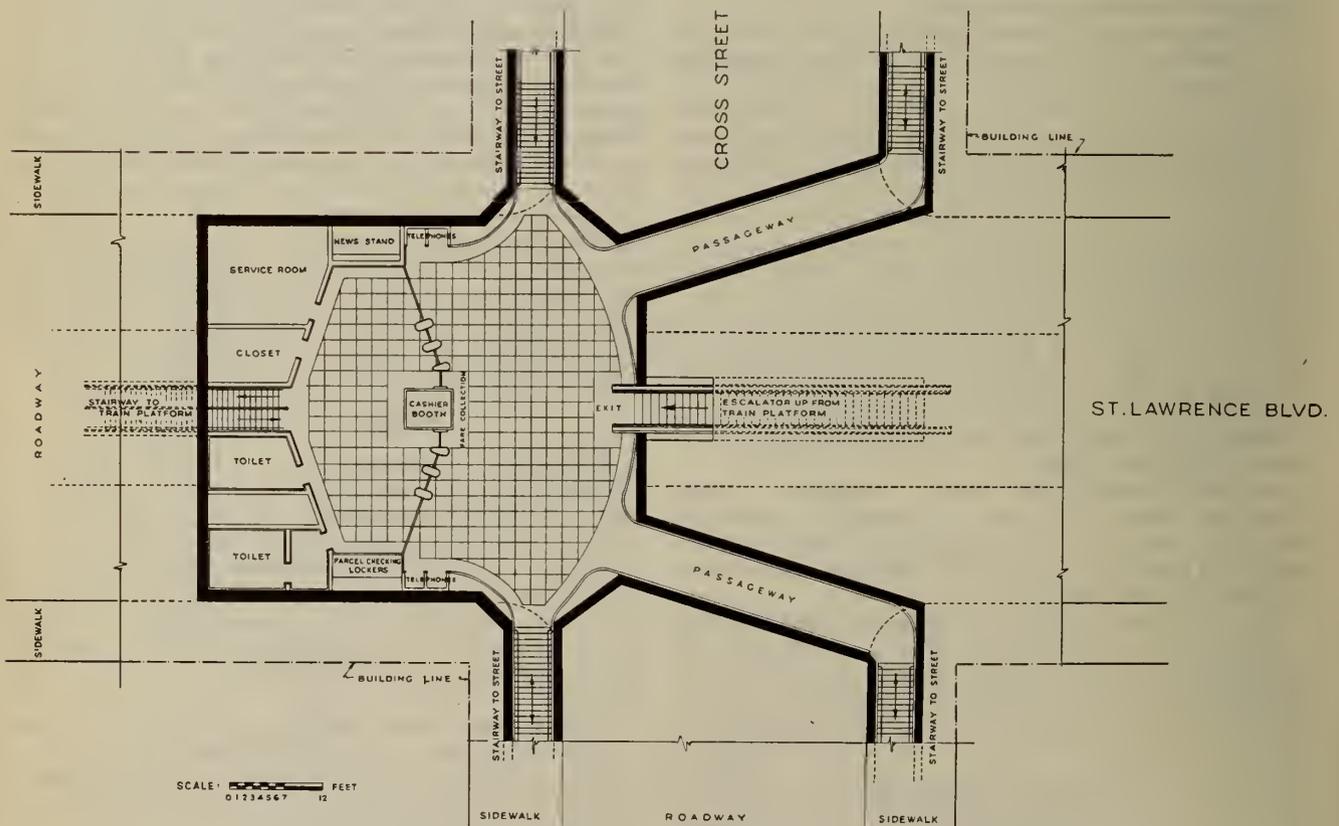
Layout of typical mezzanine for low level station with centre platform.
